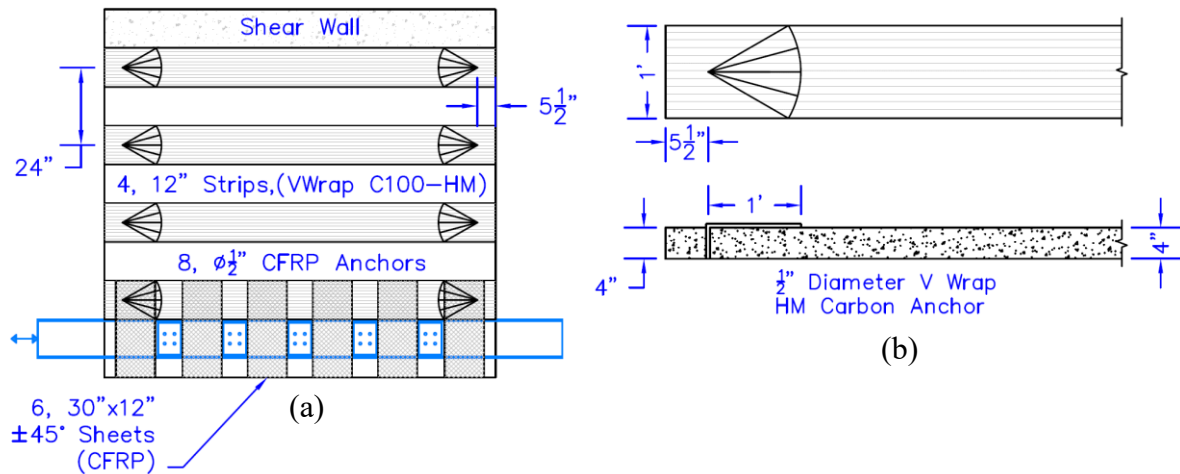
Retrofit of Specimen CD2: (a) Plan View of Retrofit; (b) Anchor Details.
